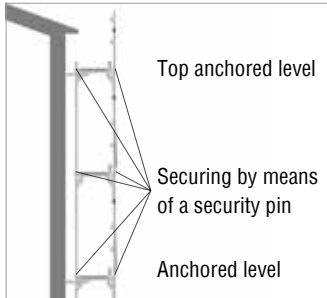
Example of the tension-proof connection of the scaffold levels for lifting wind forces for roof pitches $\leq 20^\circ$
